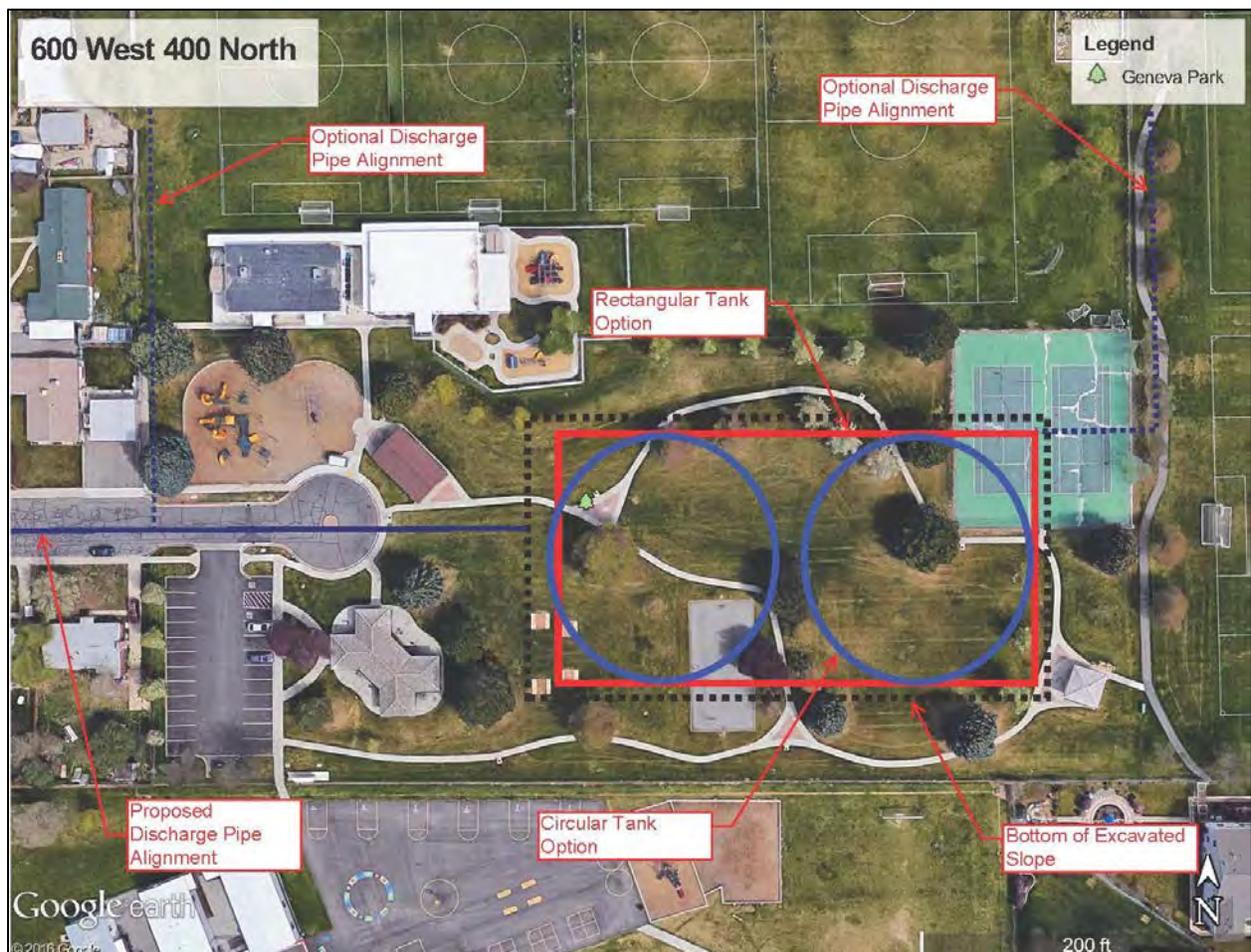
Site 1 – 600 West 400 North (Geneva Park)
